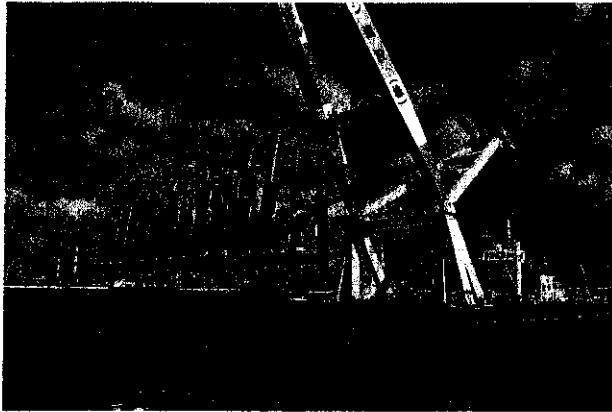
Installation of Kobe Central Jetty with jacket-type wharf
